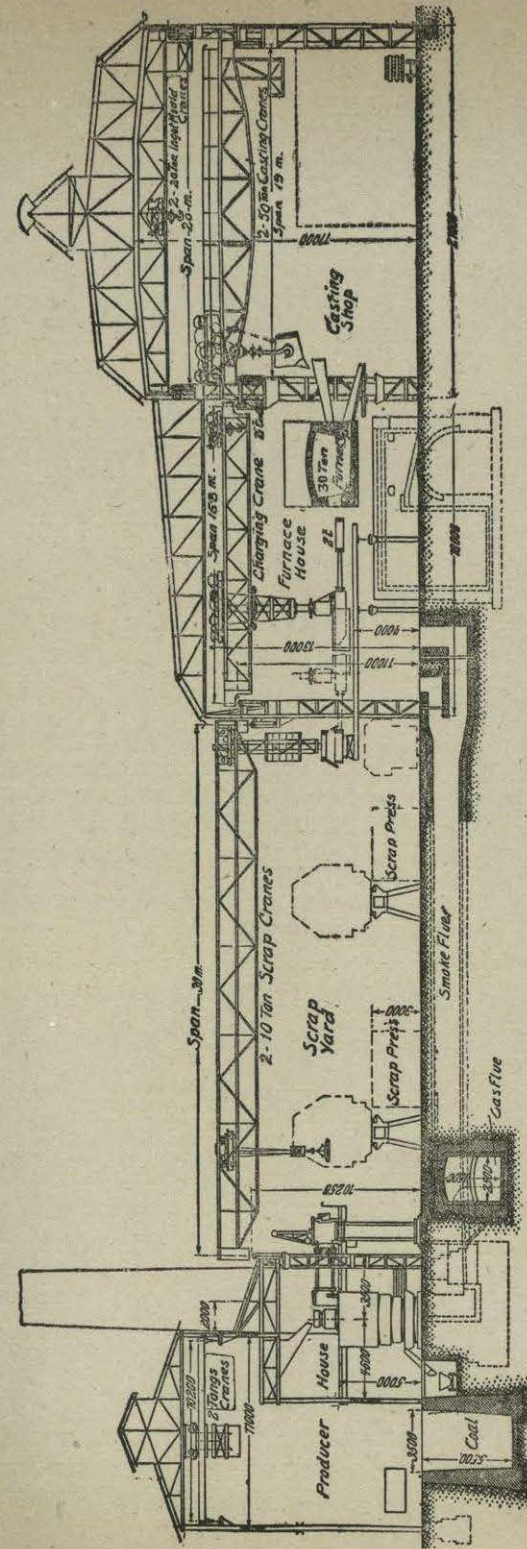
Sectional Elevation of New Plant at Bethlen-Falva Works.
